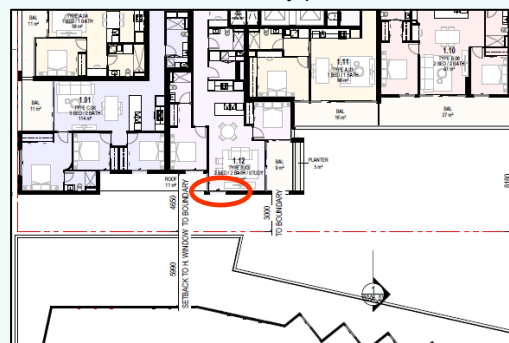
Living room windows to be redesigned / screened (Source: Application)
